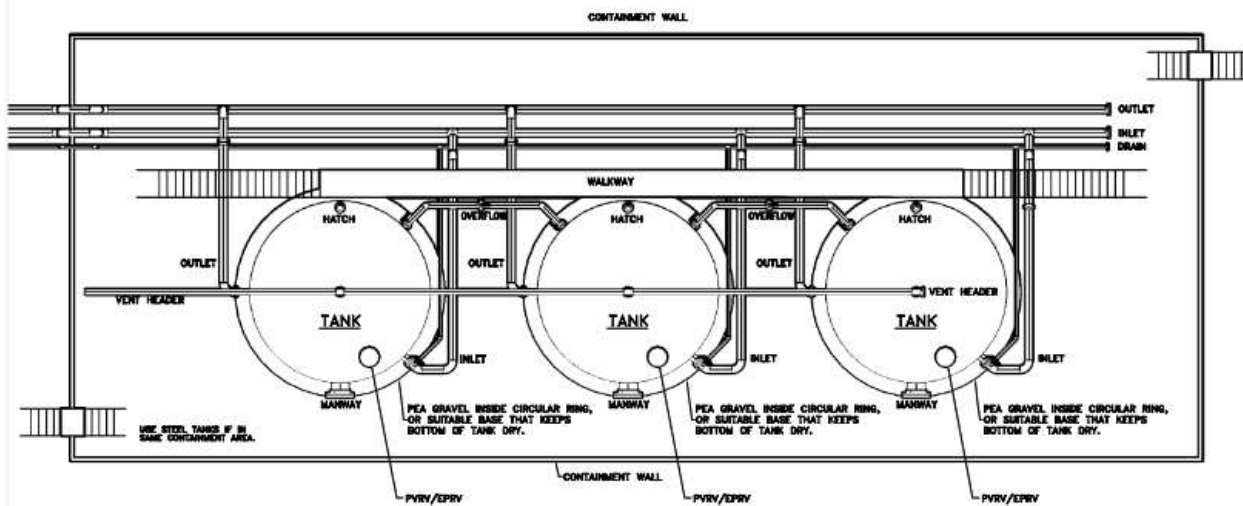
BF.2B—Example Tank Battery Installation Top View Showing Dike/ and Example Piping Configuration
